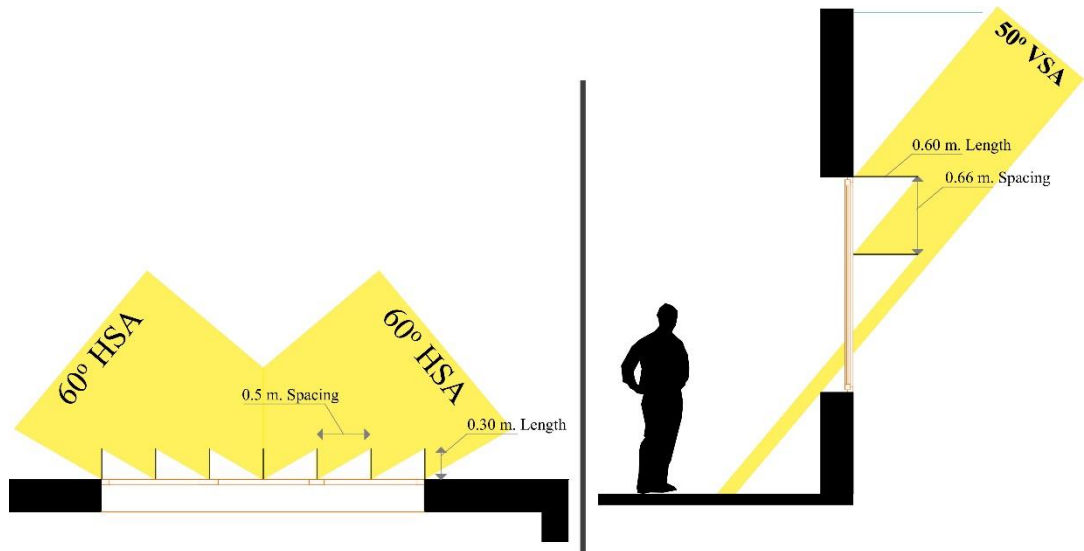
Optimized shading device strategy detail responding to the preferable (summer & winter) sun radiations for South-East façade, HSA 60°, VSA 50°. (Left) plan view (right) section (by Author).
